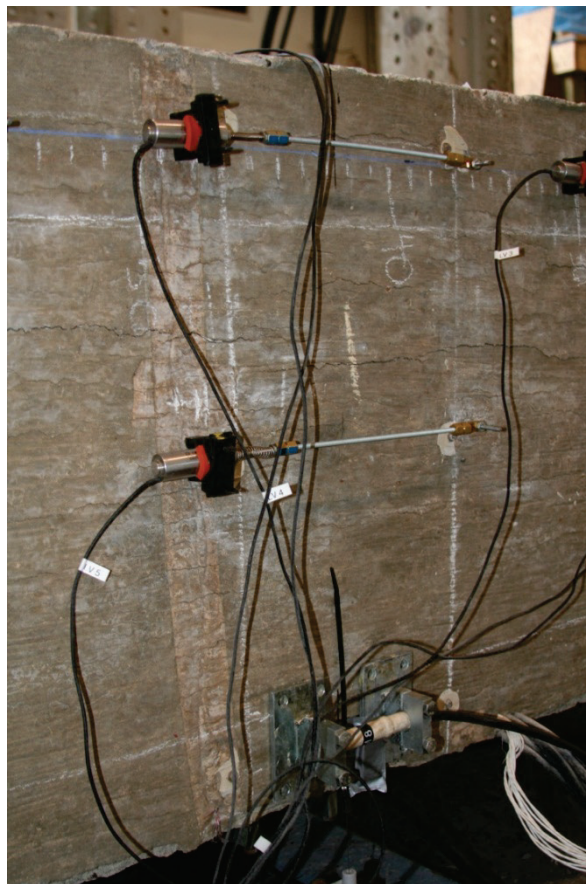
Cracking of Specimen #8 prior to Structural Load Testing.
